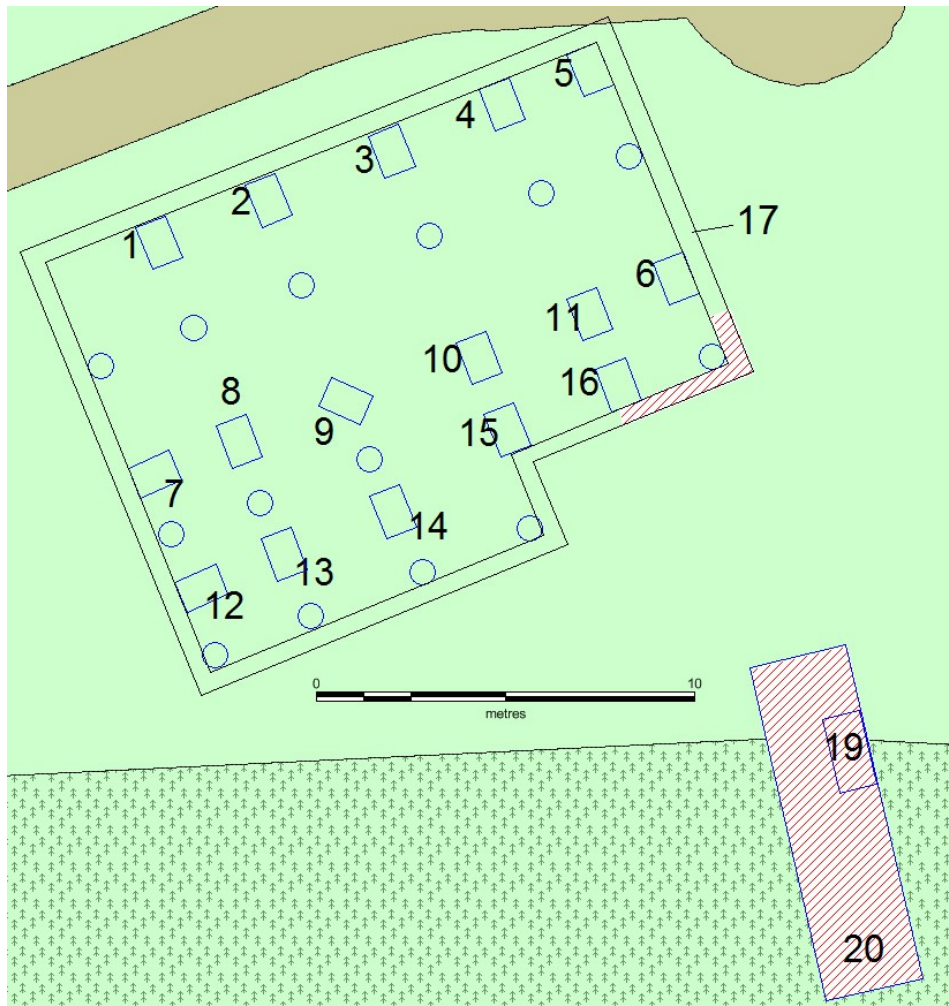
Site plan showing locations of foundation trenches and soakaway. The first phase of trenches, drilled with an auger and marked as circles, were not observed. Trench 18 was a general level reduction of the footprint of the building. Extent of brickearth shown by red hatch.
